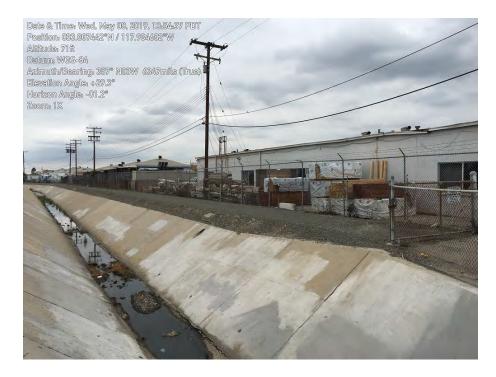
View northwest from outside the northeast corner of the proposed eastern laydown yard above the Stanton Storm Channel tunnel entrance. Industrial businesses line the north side of the Channel.
